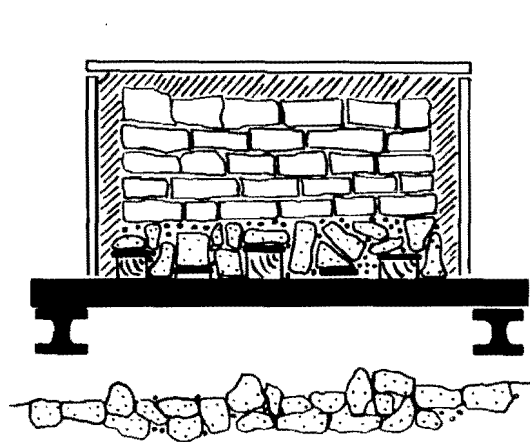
Structure on rubble foundations has been detached. Metal support plates rest on wooden blocks on main side girders.
